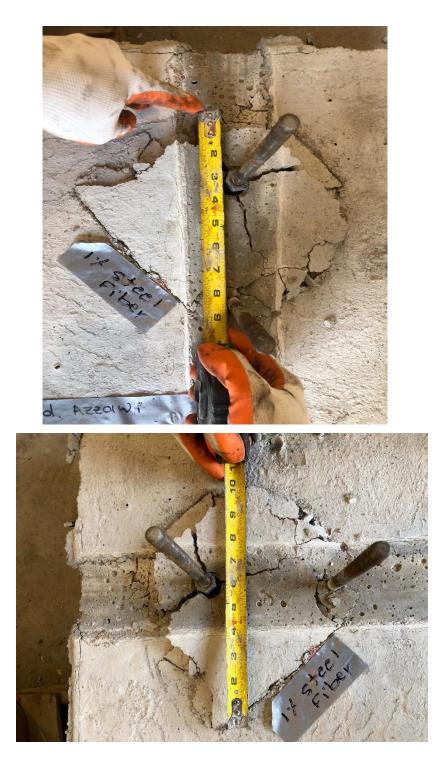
Concrete Breakout Failure (1.0% SFRC)
